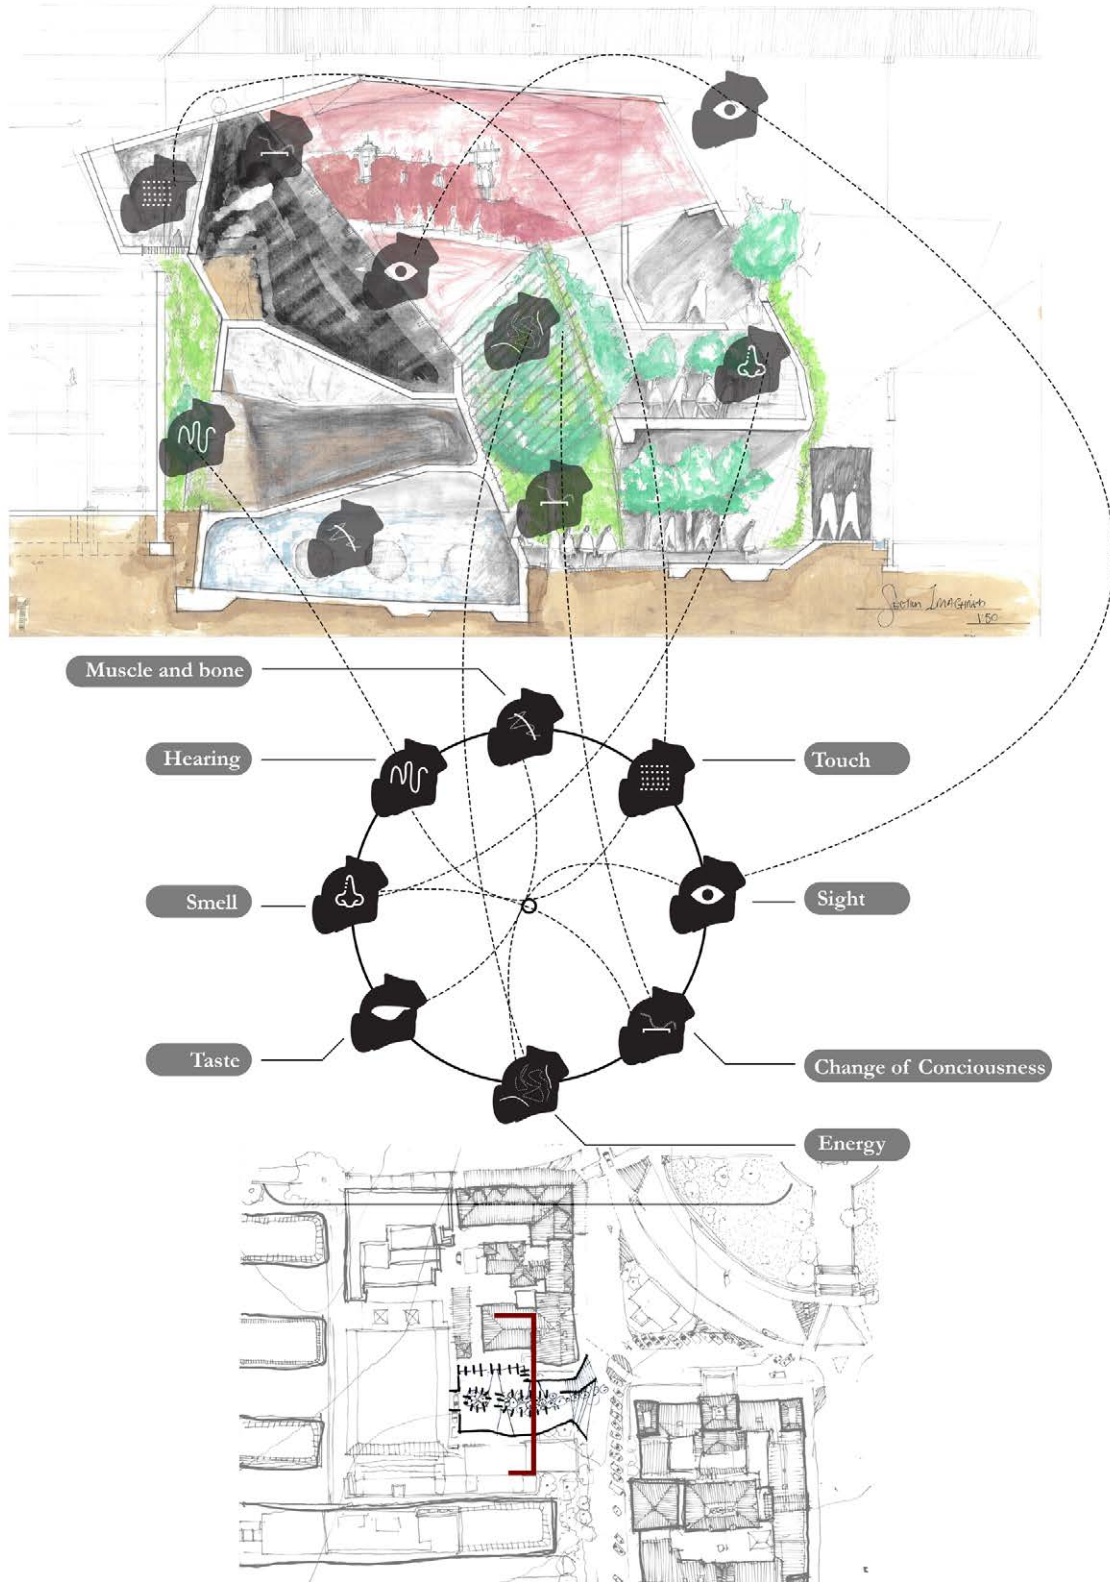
Site plan depicting potential position of building on site (Author, 2018)
